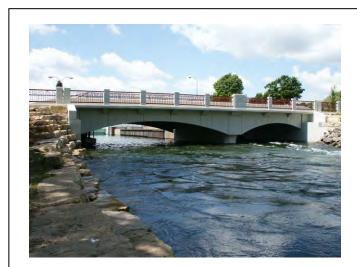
Shoreline Protection at Sherman Avenue Bridge in Tenney Park
